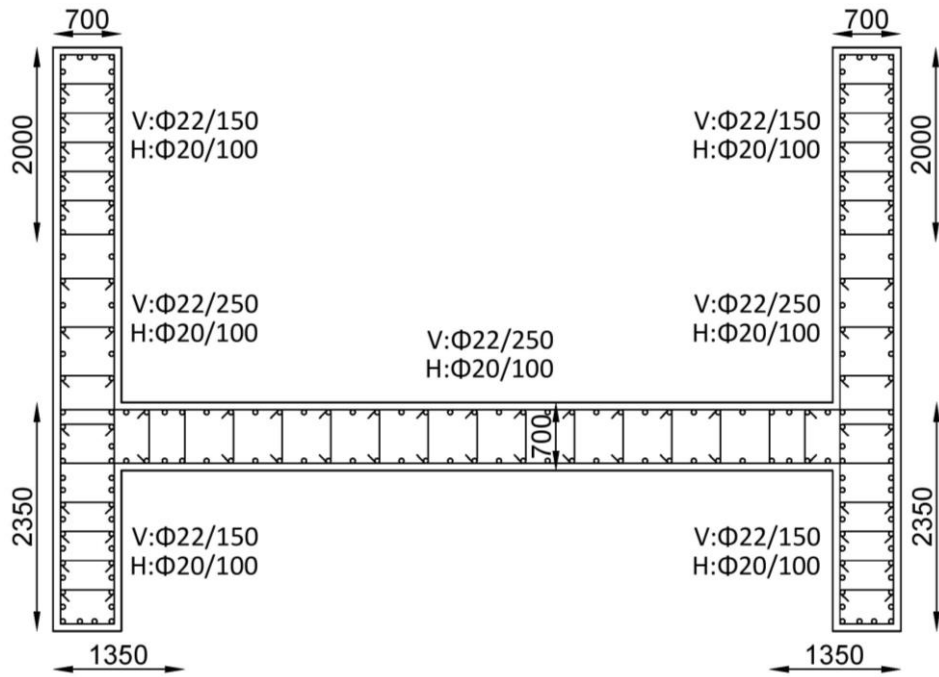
Shear Wall Longitudinal Reinforcement for Stories Between 11 - 20
